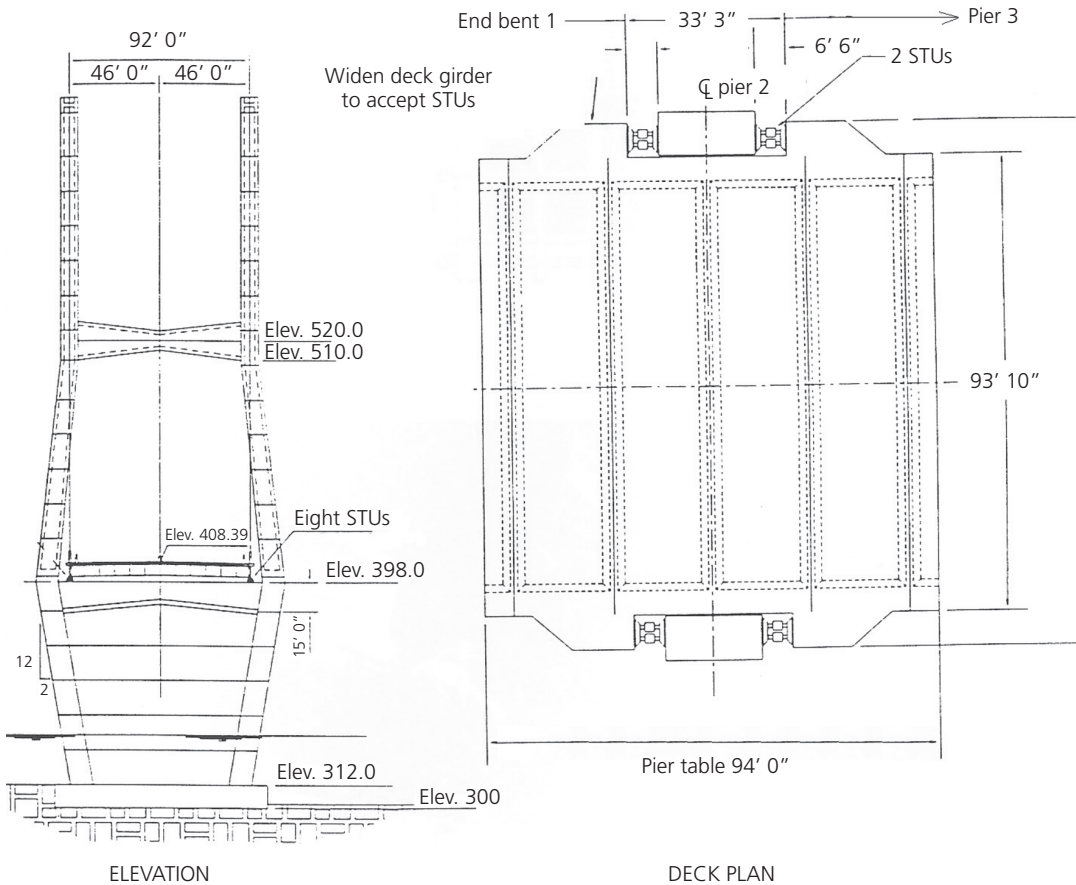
Installation of STUs on the Cape Girardeau Bridge
